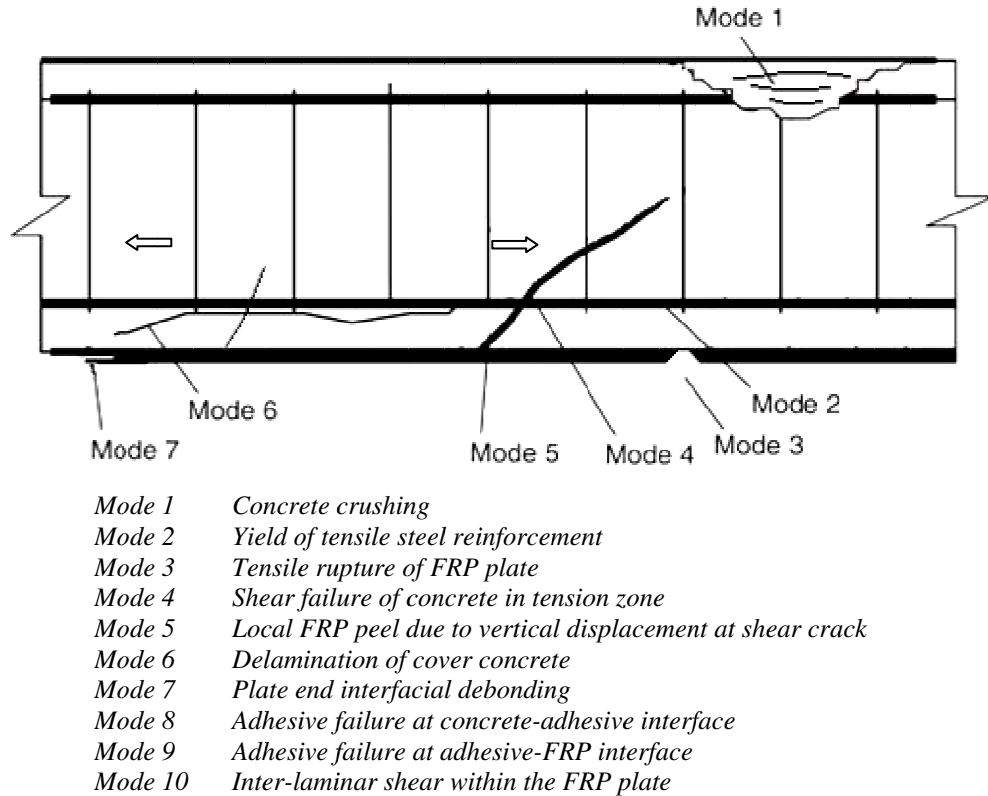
Typical failure modes in RC beams strengthened by FRP's
